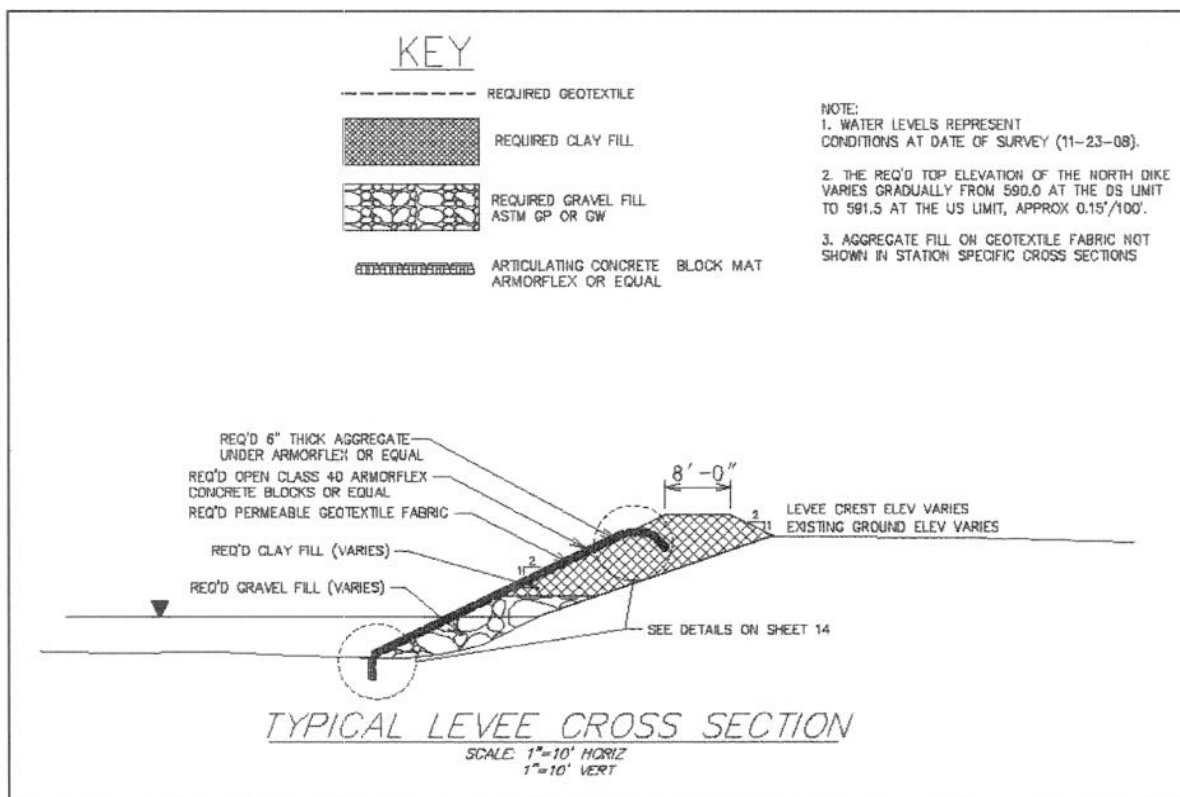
Typical cross section detail for reconstructed levee with concrete block mat (NTS).
